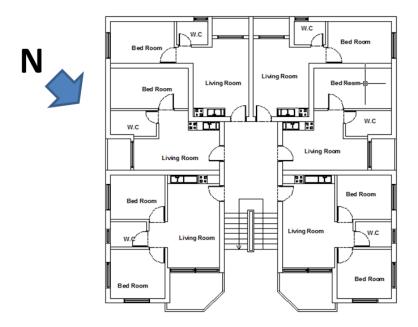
Typical Floor Plan of Old Building, Hasan Hoca 2, (Author, 2013)
